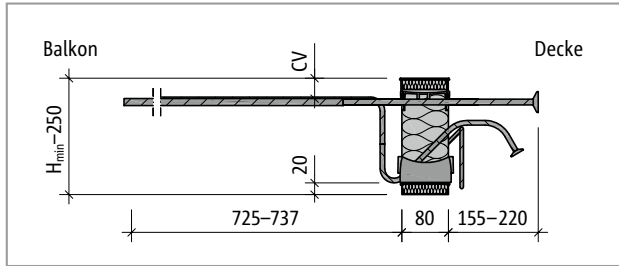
Schöck Isokorb® T type K-U-M4: Product section
